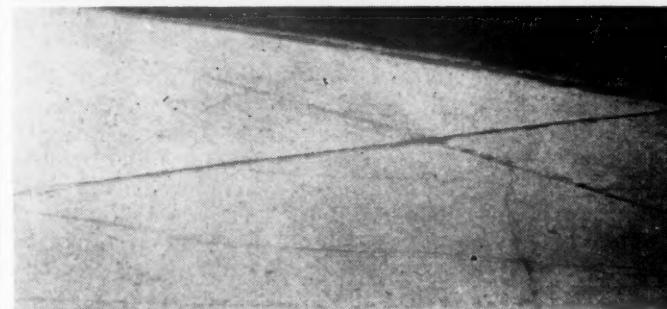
CRACKING NEAR JOINTS CONTAINING LOAD-TRANSFER DEVICES THAT RESIST UPWARD FLEXURE.
